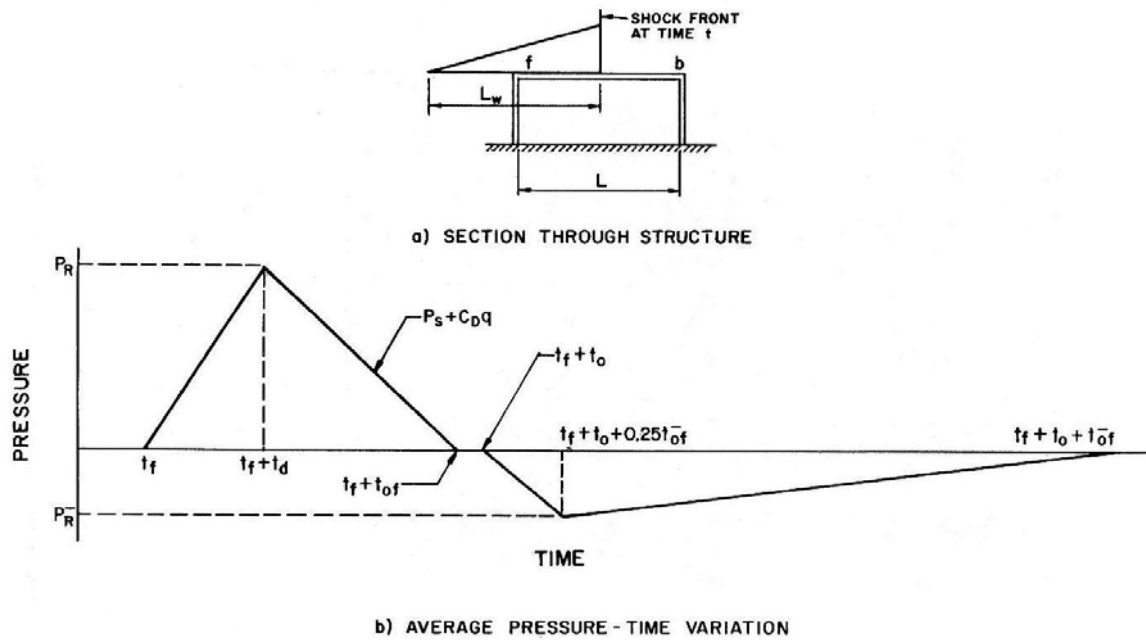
Roof and side wall loading (TM 5-1300, 1990)
